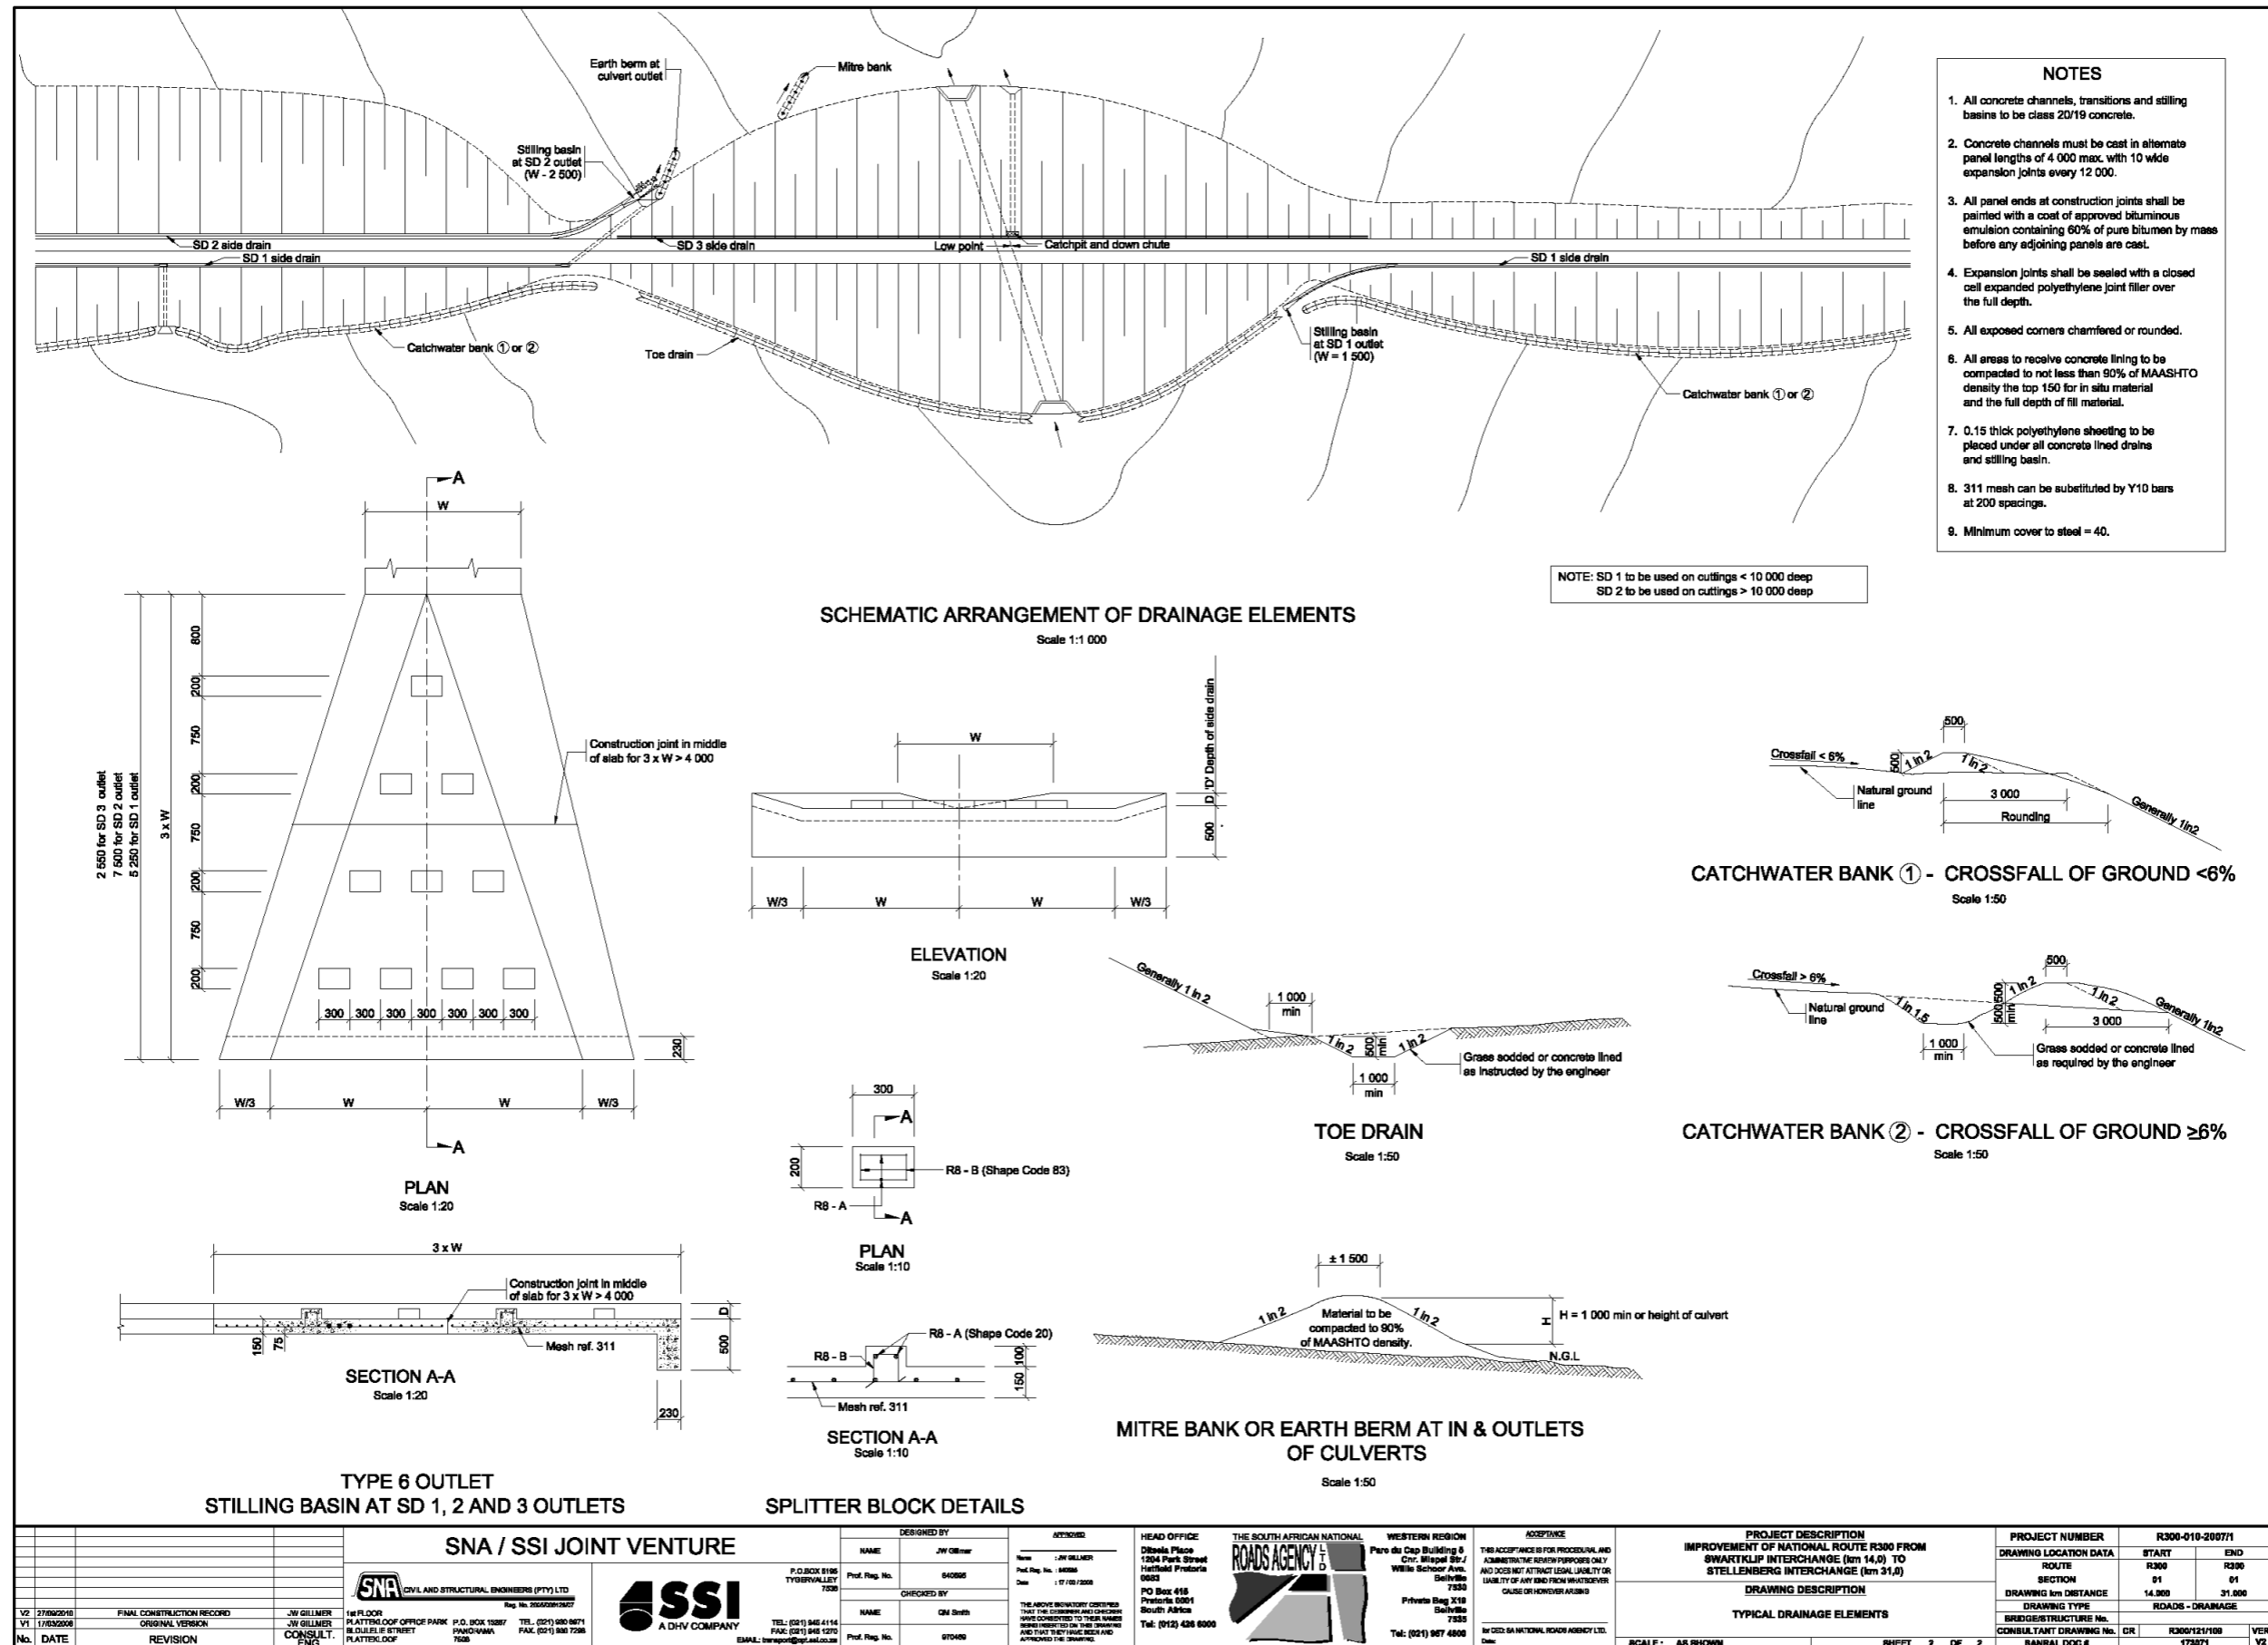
Typical drainage elements (2) (SNA-SSI Joint Venture, 2008)
